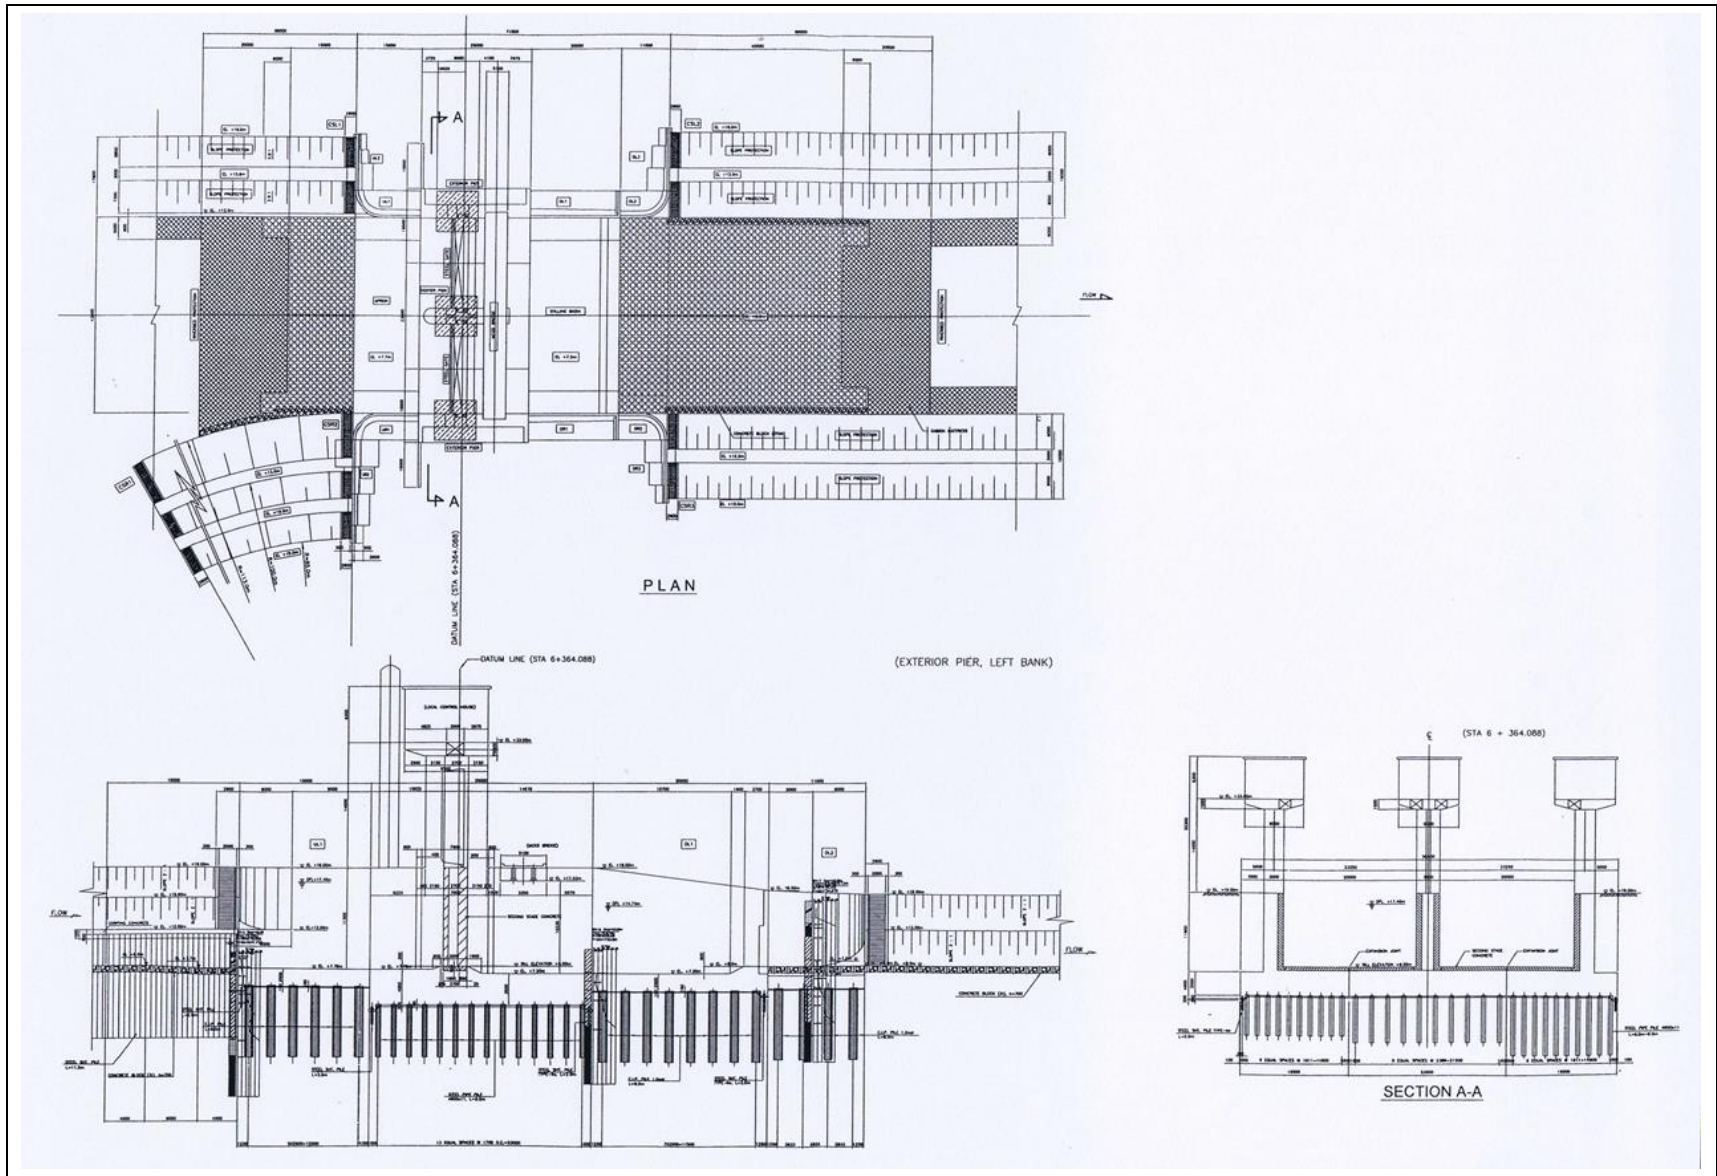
Layout Plan and Cross Section of MCGS
